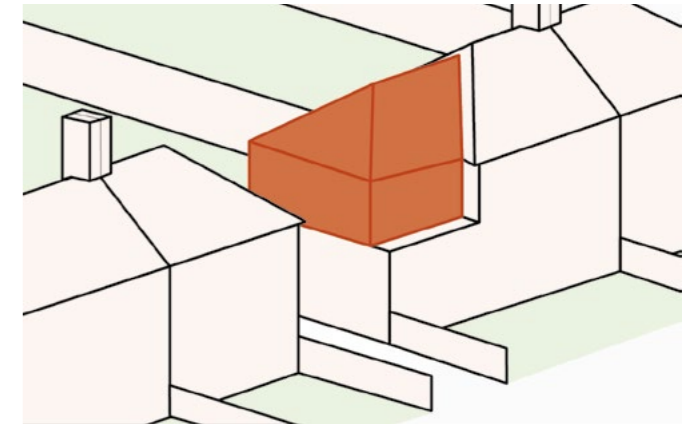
A first floor side extension above an existing extension, with the new extension set back from the front elevation to remain subservient and with a pitched roof sitting below the ridgeline
